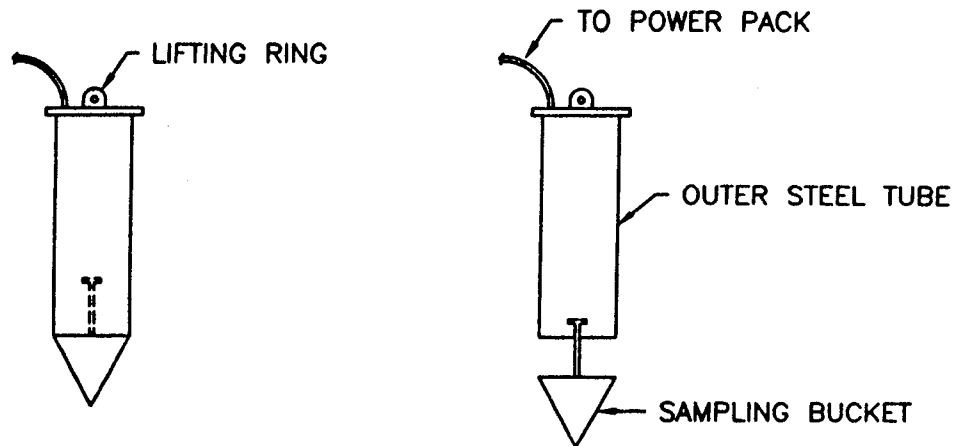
DMM wall sampling tool (Bahner and Naguib, 1998).
